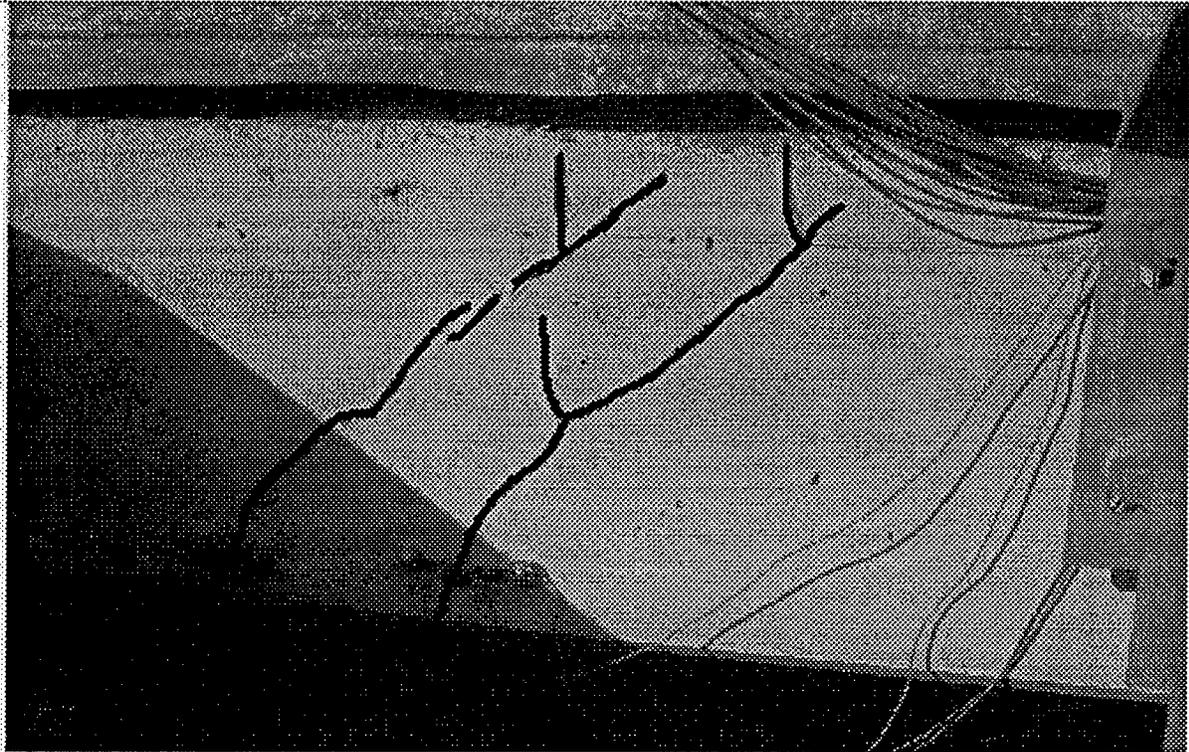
Diagonal Cracks in Beam #9 (cracks highlighted to show detail)
